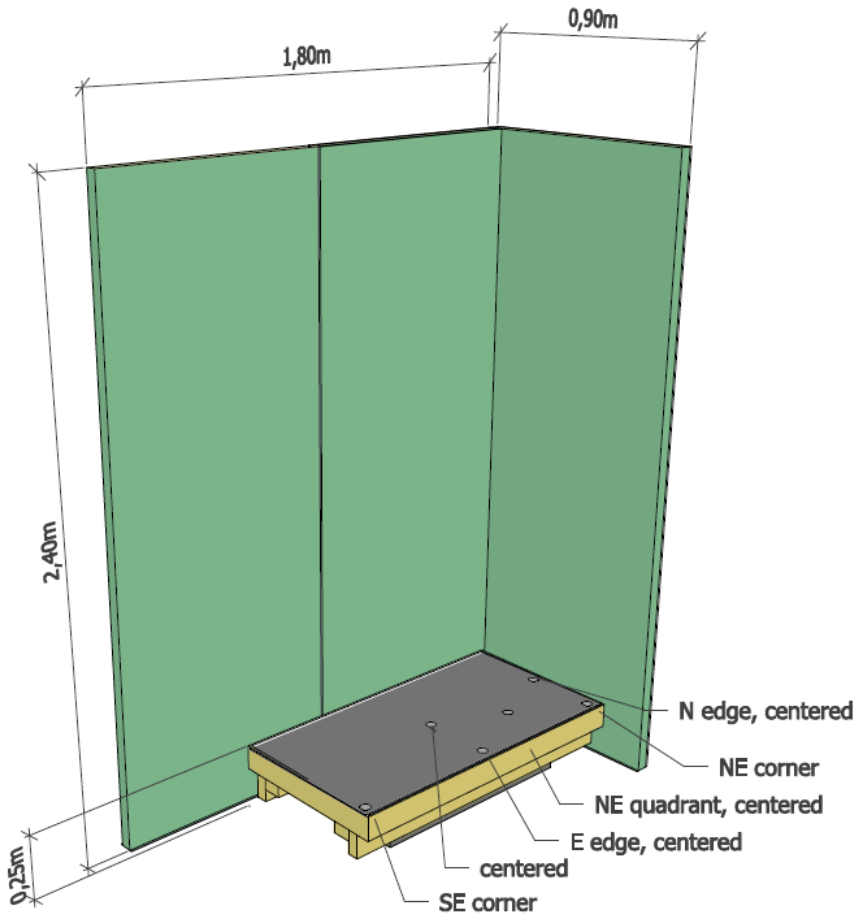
corner wall configuration used in this study for both GPB and PB wall setups
